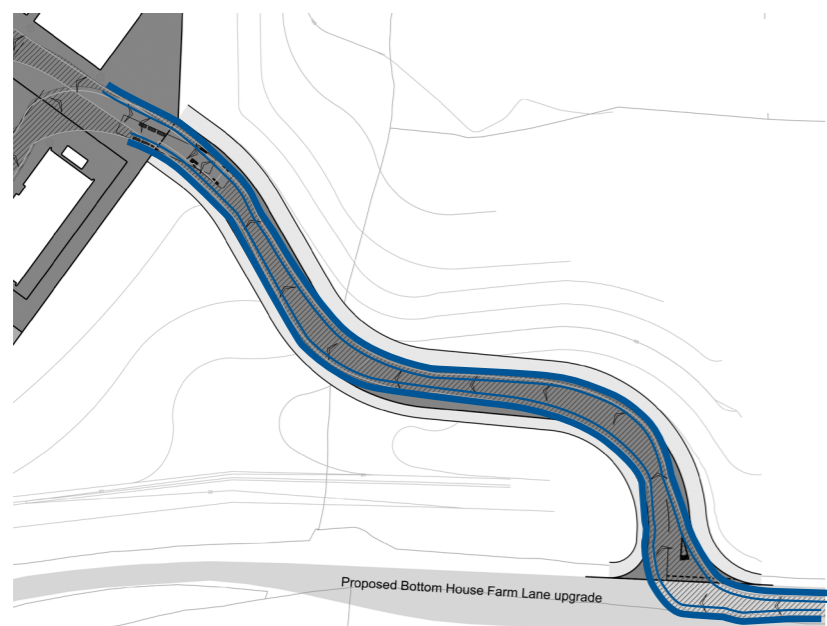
Plan - Access road swept path for articulated vehicle
